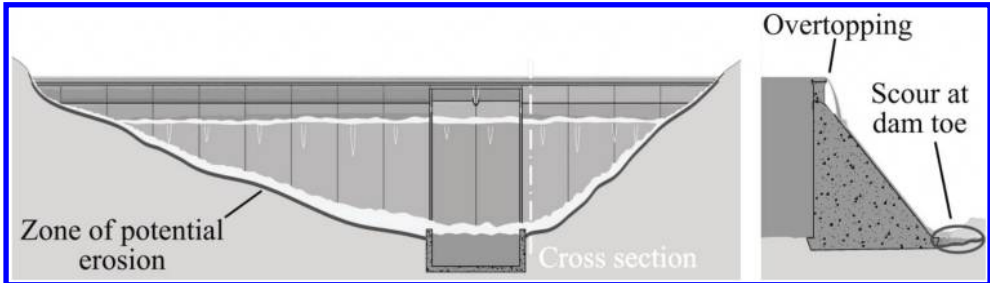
Overtopping situation in a non protected concrete dam (Elevation and cross section views).
